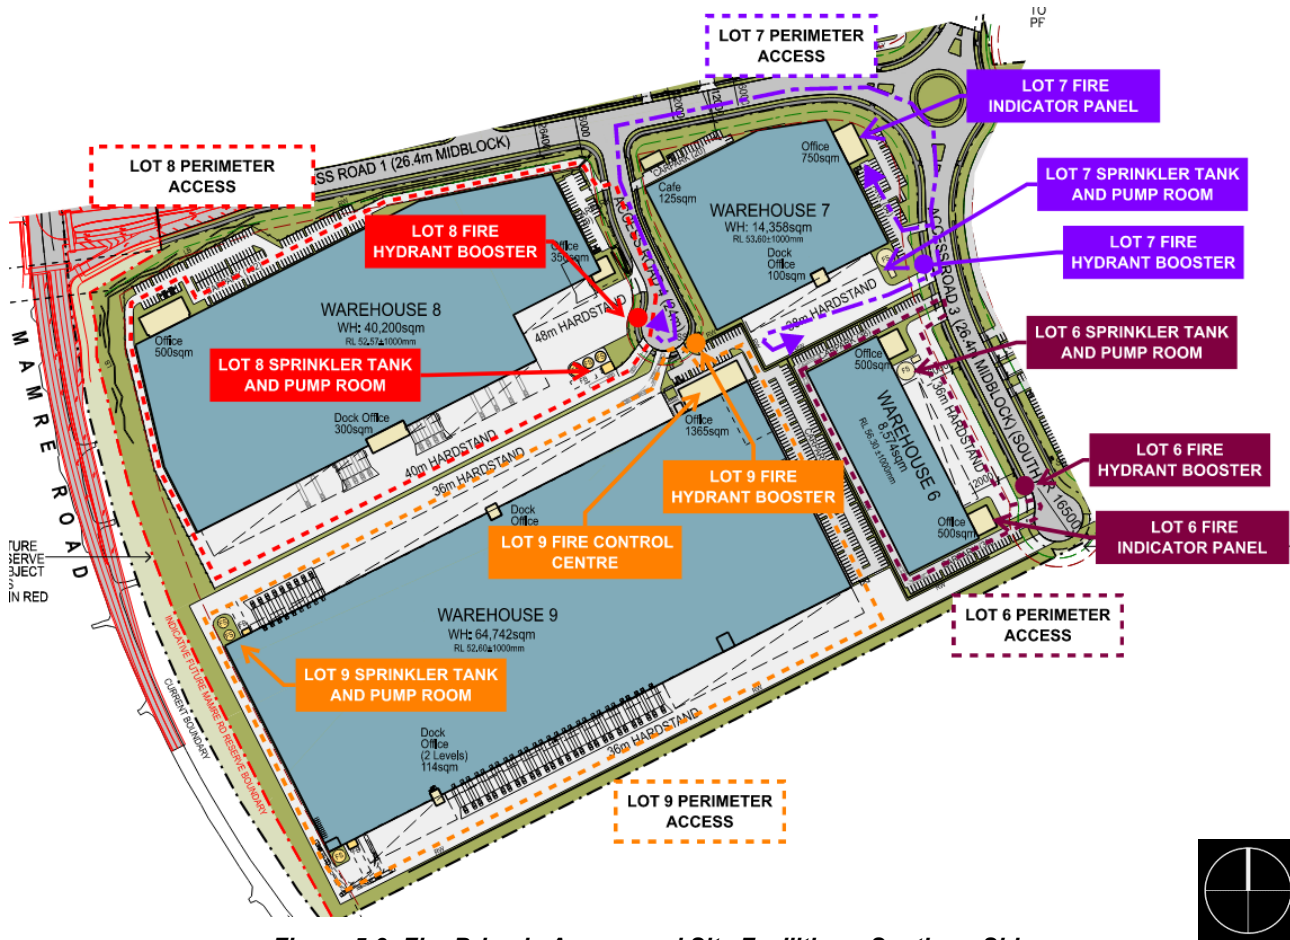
Fire Brigade Access and Site Facilities – Southern Side
